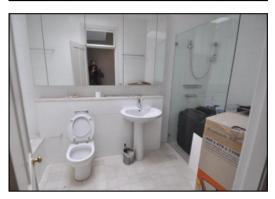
The family bathroom on the third floor. It was noted that all bathrooms had been typically modified and had contemporary finishes, fixtures and fittings.
